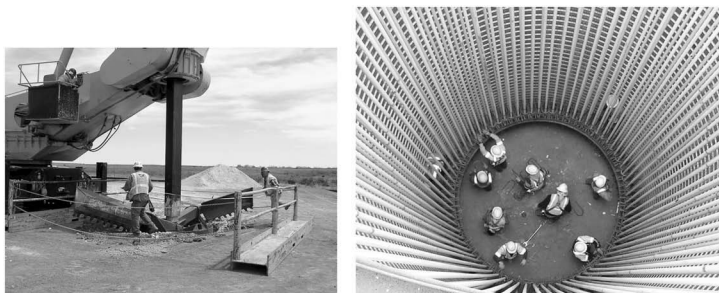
Placing rebar for pad foundation for 2-MW wind turbine. Finished pad will require 32 metric tons of rebar and 270 cubic meters of concrete.
